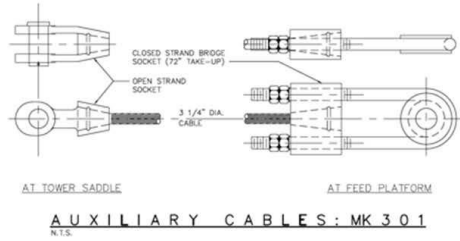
Cable details, drawing S-13, specific to the failed M4N auxiliary cable.²
